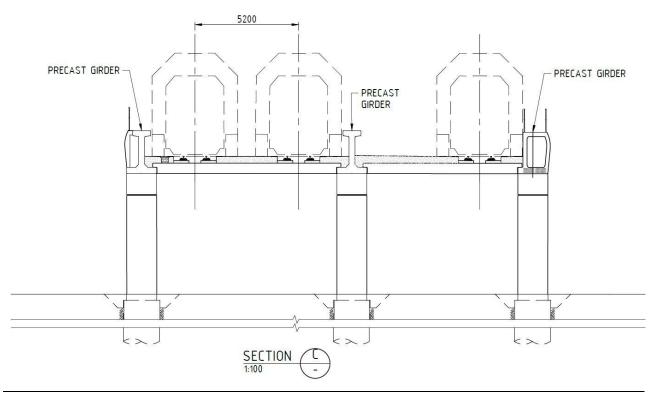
Elevated Cross Section of Modular Viaduct Structure with external girder that can accommodate future expansion
